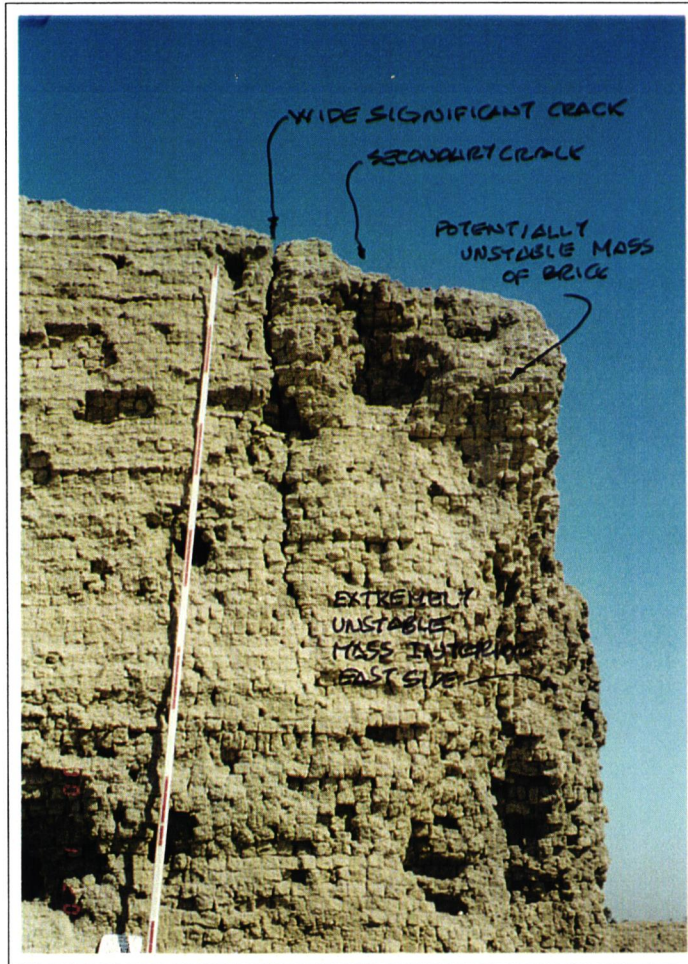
West Main Enclosure Wall Near West Entrance
